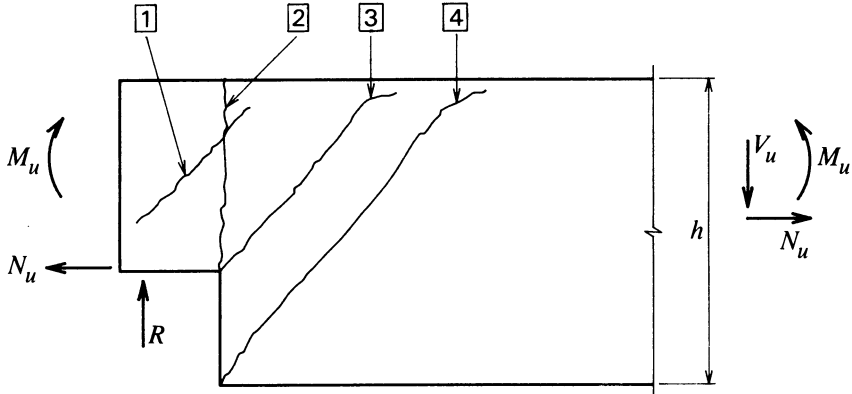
Locations of potential cracking influencing reinforcement details in a dapped end beam.
